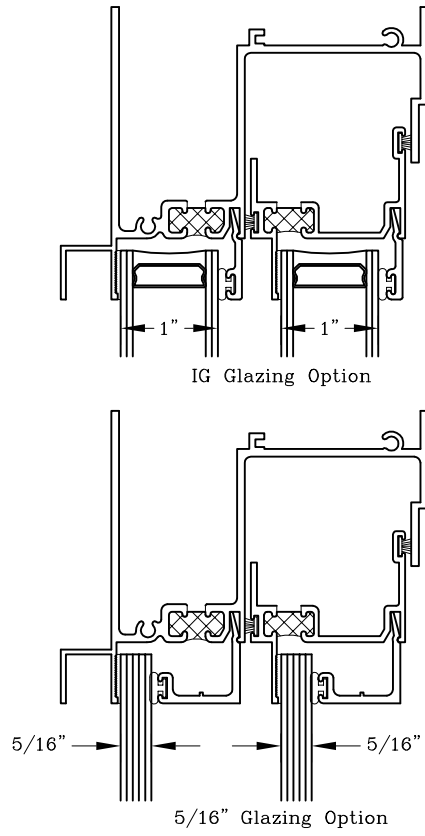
/2 Scale - For Custom Size Drawing Contact Graham
